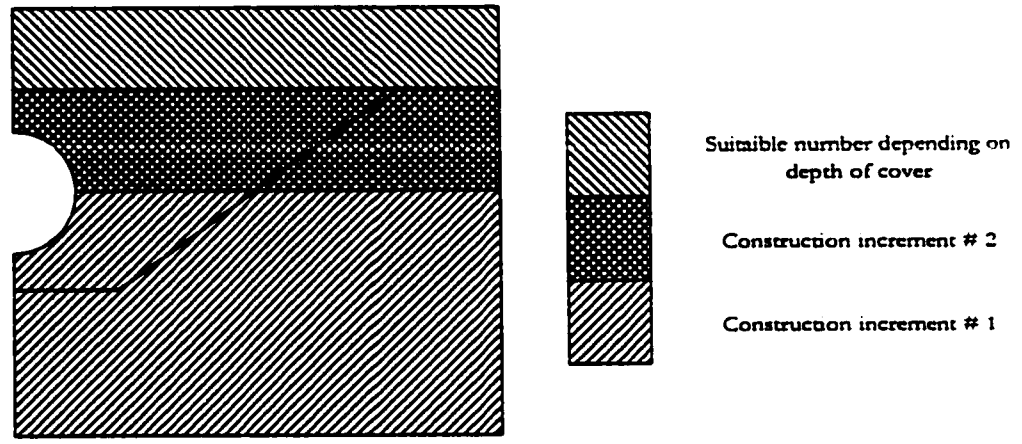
Construction increment sequence for embankment type of installation used in test runs
